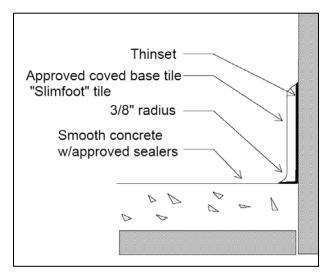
Sealed concrete floor and "slimfoot" ceramic cove base
